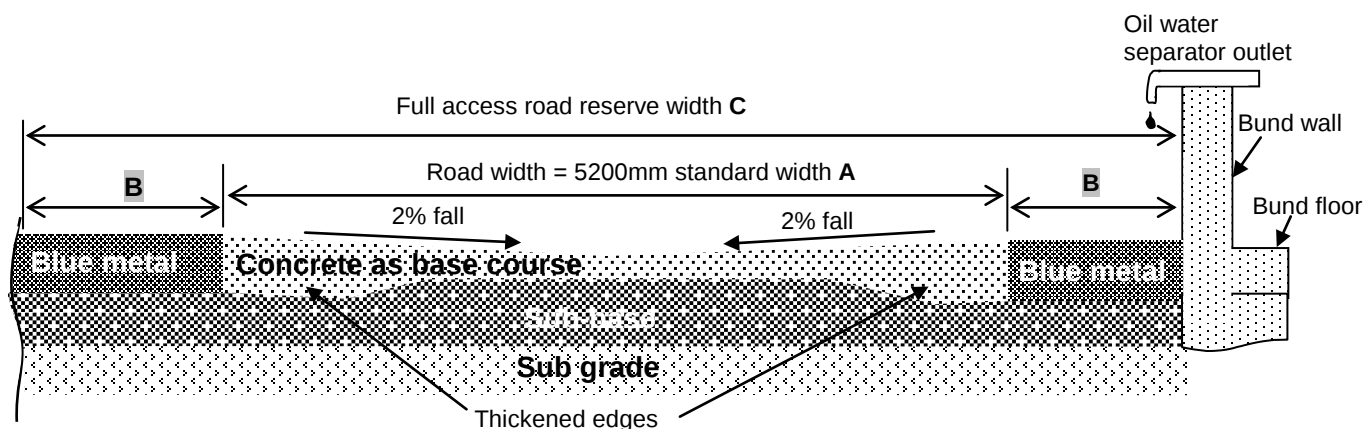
Sketch of cross section of typical road section abutting bund with same floor level (reinforcements not shown)
